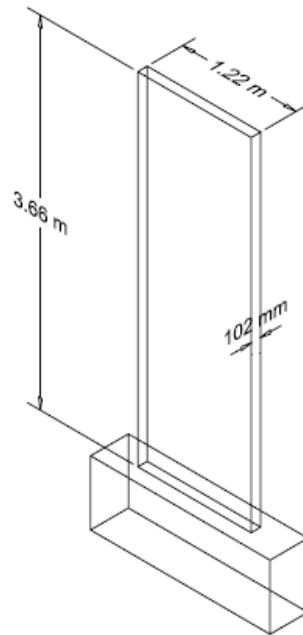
RC wall specimen tested by Thomsen and Wallace (1995).
